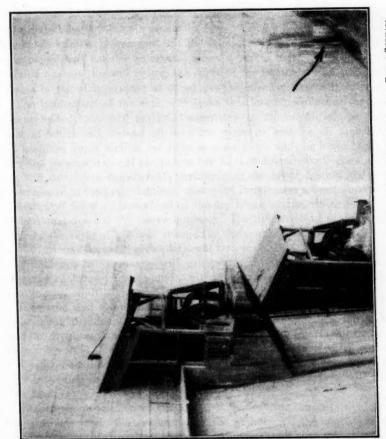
,—Arrow Shows Place at Which Asphalt Was Leaking Out at Down-Stream Face from Water-Stop at Up-Stream Face and Through Narrow Contraction Joint.
